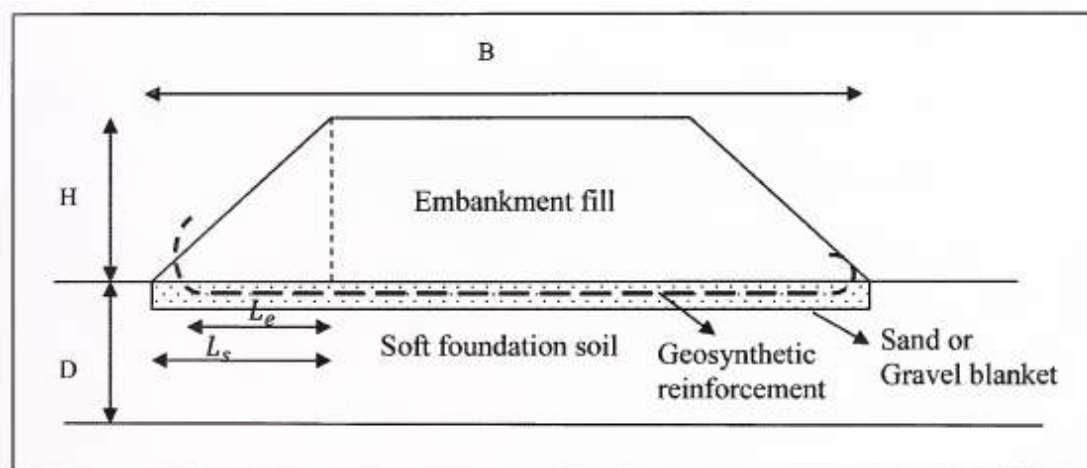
Basal reinforcement provided as a layer for stability of embankment
